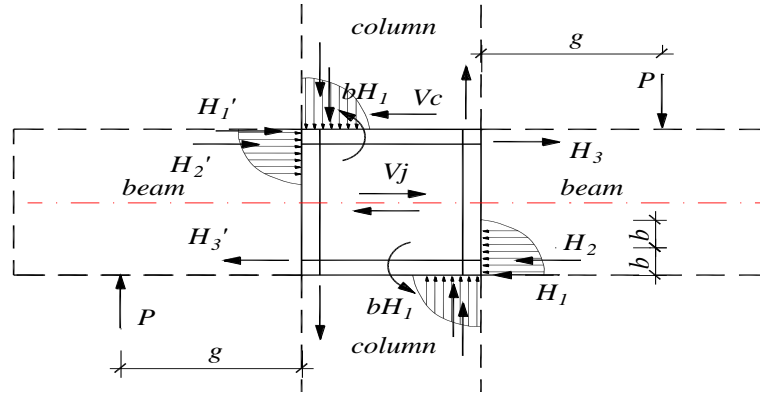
New definition of joint shear in interior RC beam-column connection with the calculated forces H_1 , H_2 and H_3
